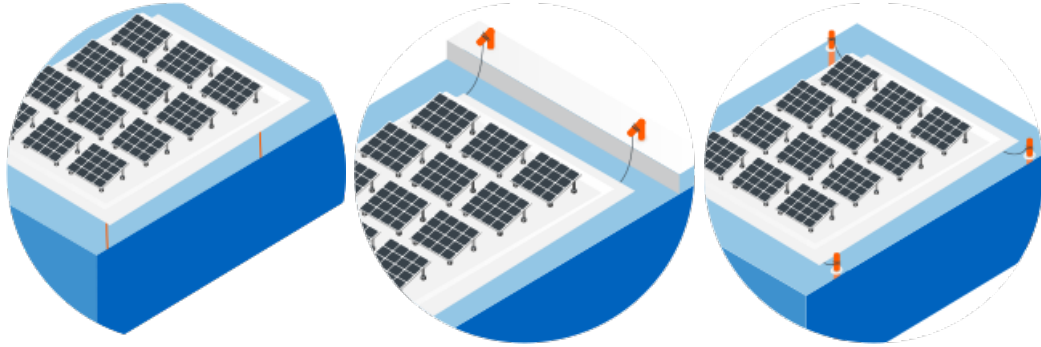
Illustration of anchoring methods for floating PV installations. From left to right: bottom anchoring, shore anchoring, pile anchoring. (Iberdrola, n.d)
